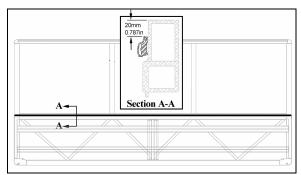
FACE FIXED WINDOWS - RUBBER SEAL INSTALLATION
